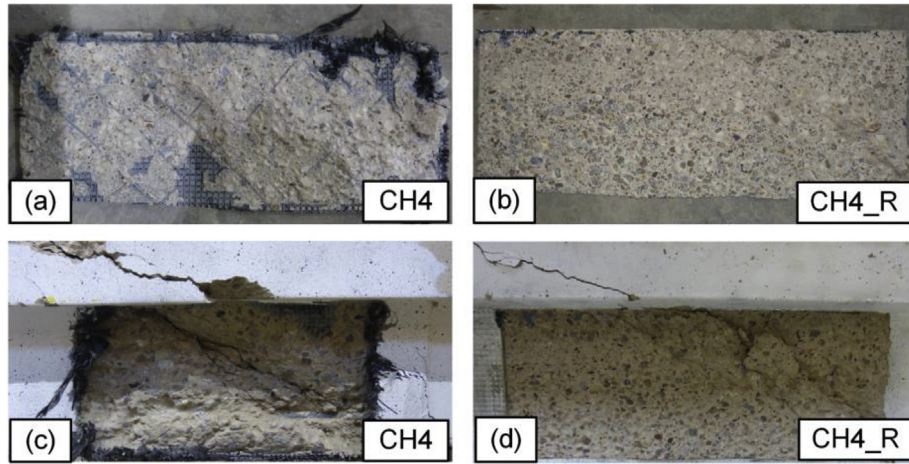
(a)–(b) Part of U-shaped jacket of specimens CH4 and CH4_R; (c)–(d) shear crack in concrete of specimens CH4 and CH4_R after removal of the jacket.
